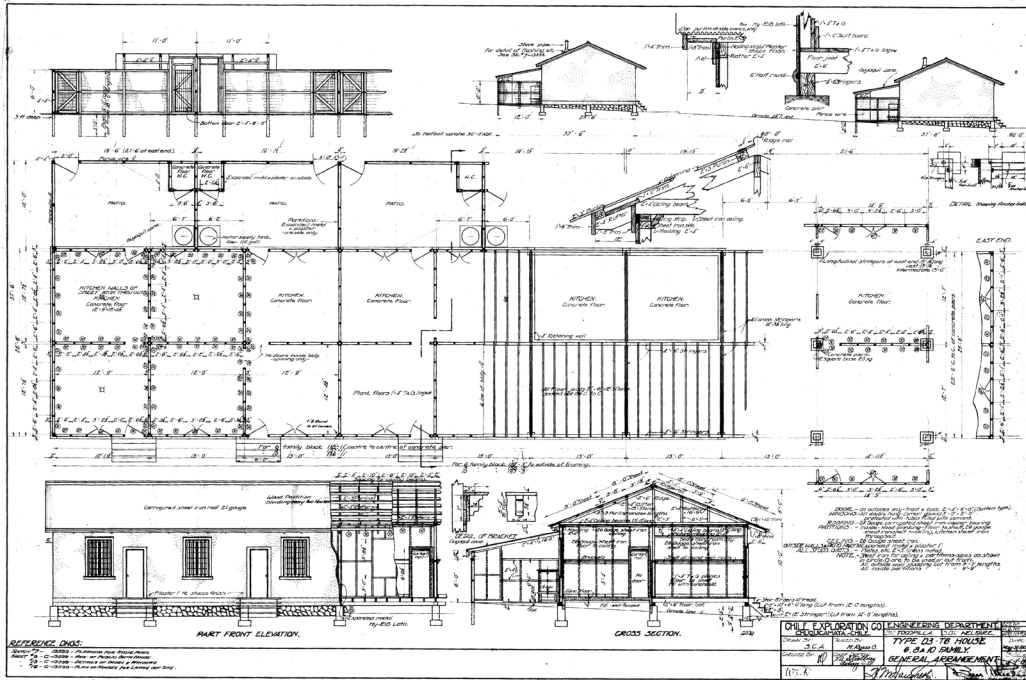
Constructive details of the Company town's houses. Source: ACECCh, May 31, 1924.
